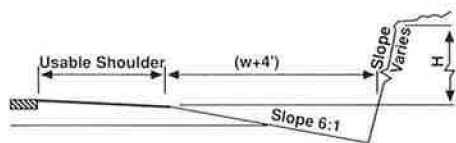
Roadway section on rock slope—Design A, Stage 1.
